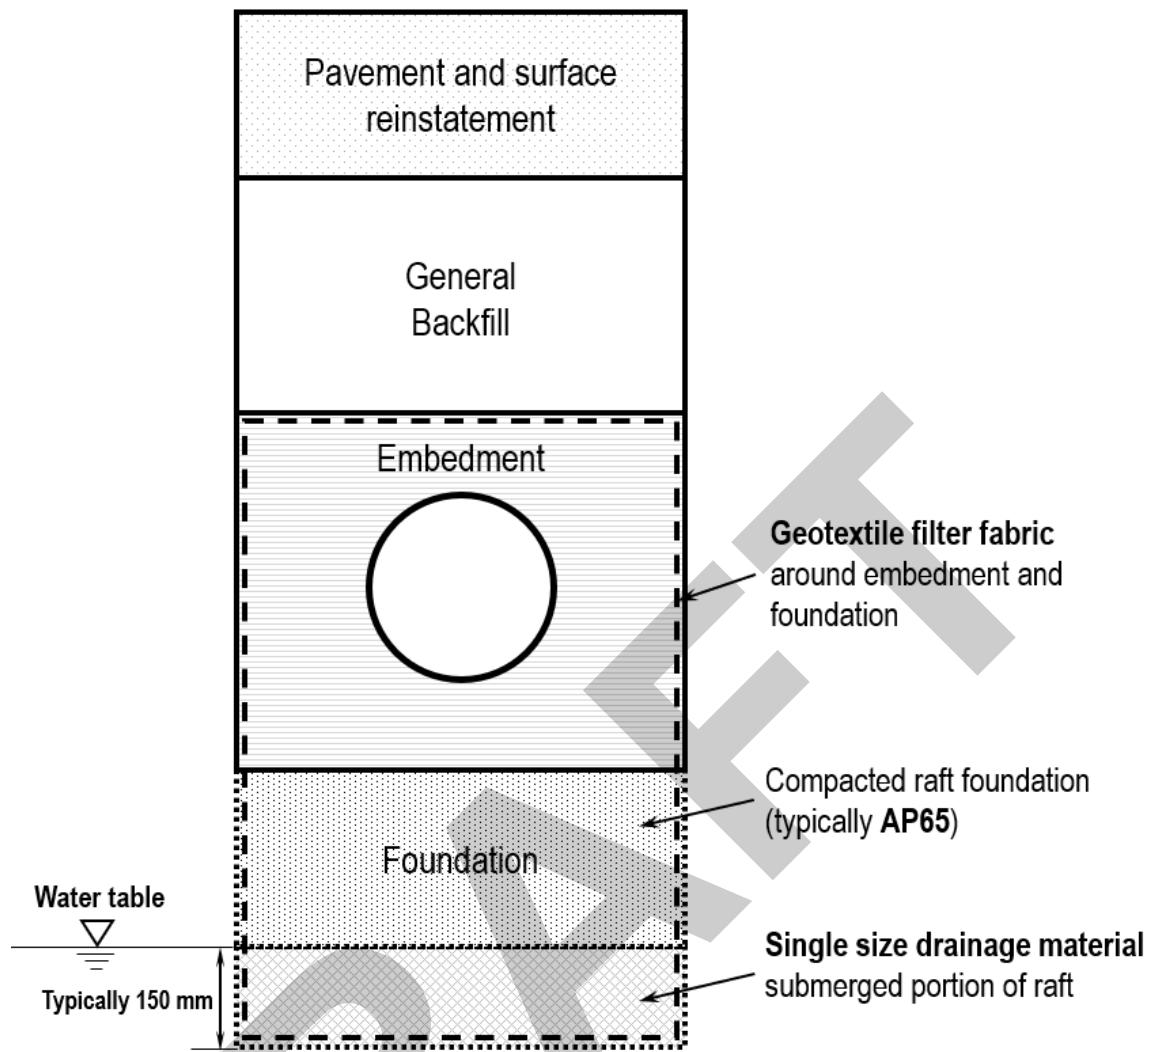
Typical trench arrangement with a raft foundation constructed of imported fill
